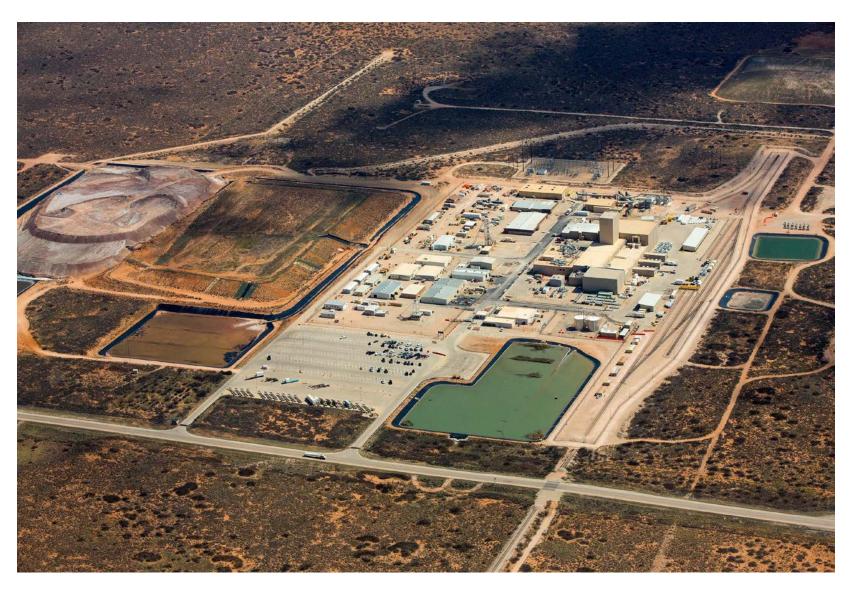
Aerial Photograph of the Waste Isolation Pilot Plant
